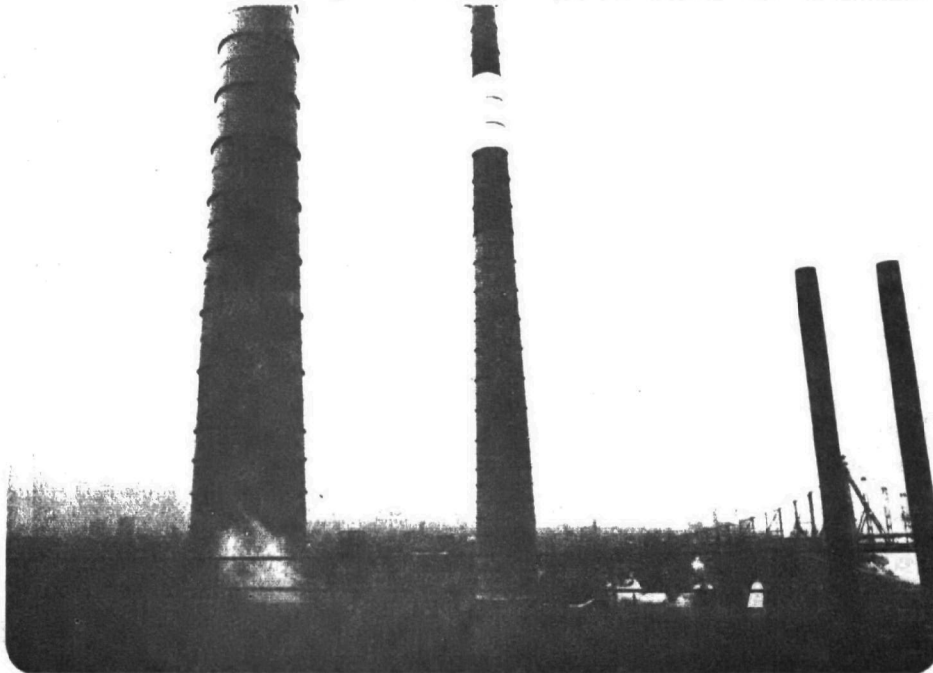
View from the roof of Boiler 30 looking south-southeast. Stacks 10 and 20 are shown in the center of the photo from right to left, respectively.
